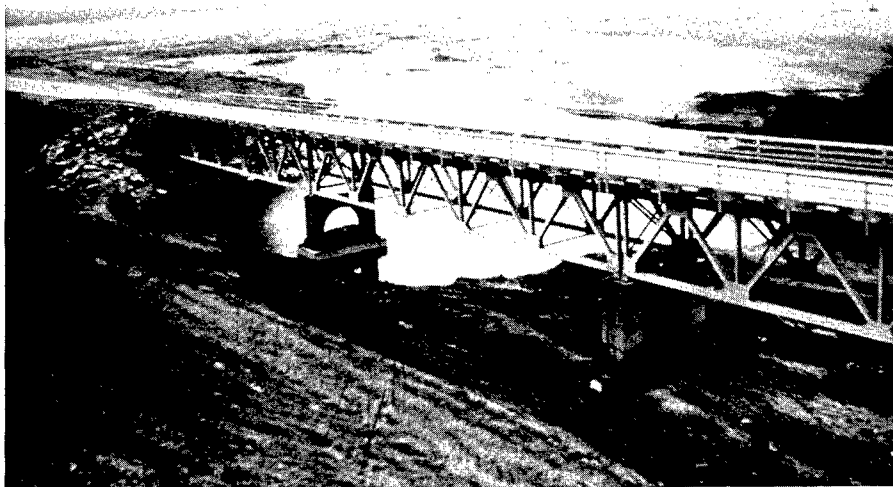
Scour hole formed at breached terminus of levee and U.S. Highway 159 bridge embankment, causing failure of approach embankment. View from top of railroad embankment, near Rulo, Nebraska.
